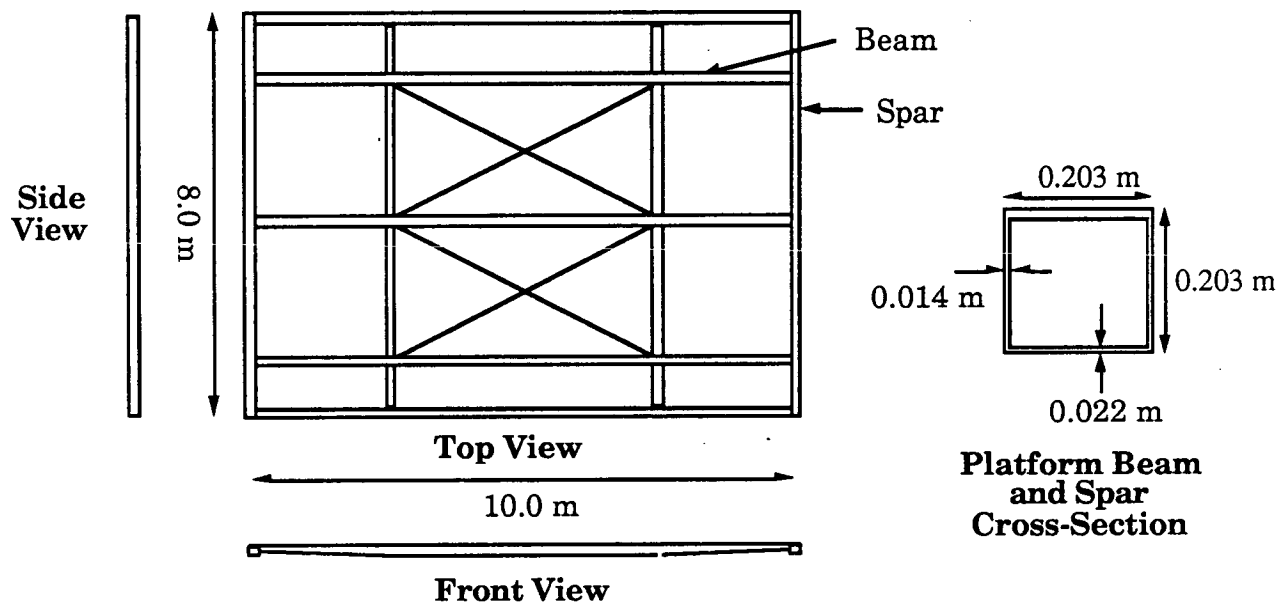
Platform and Beam and Spar Cross-Sections
